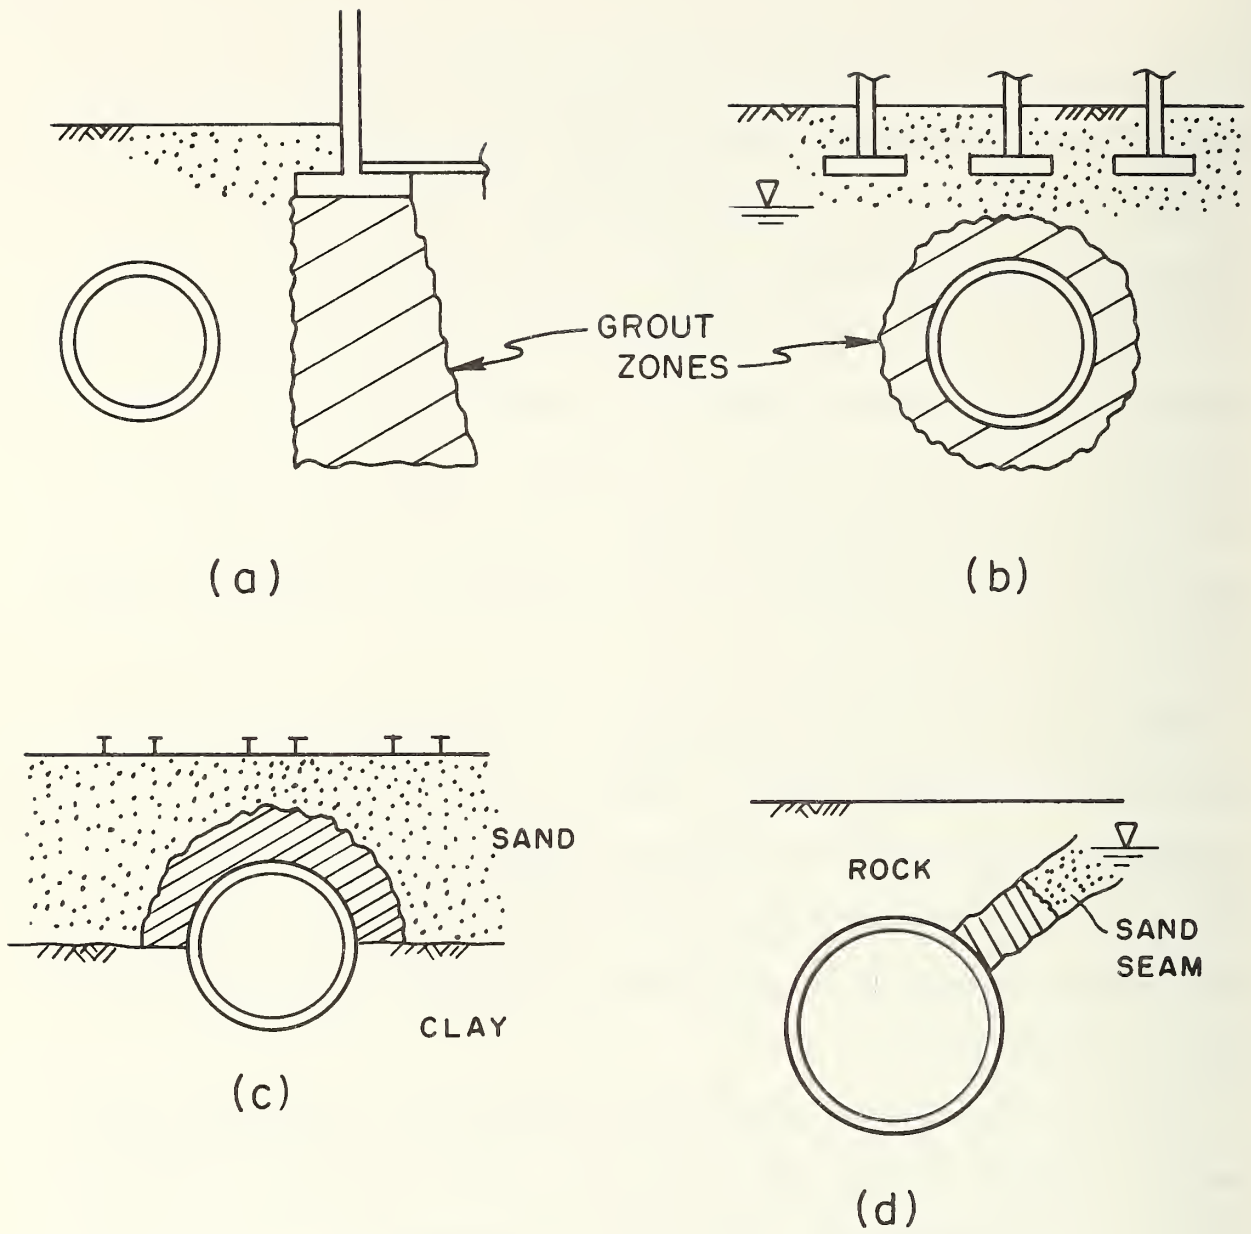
EXAMPLES OF APPLICATIONS FOR GROUTING IN URBAN TUNNELING
